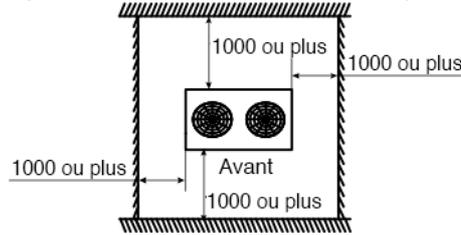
K2F-2230(2295, 2345, 2405, 2460) DN4S dimensions (unité : mm)
